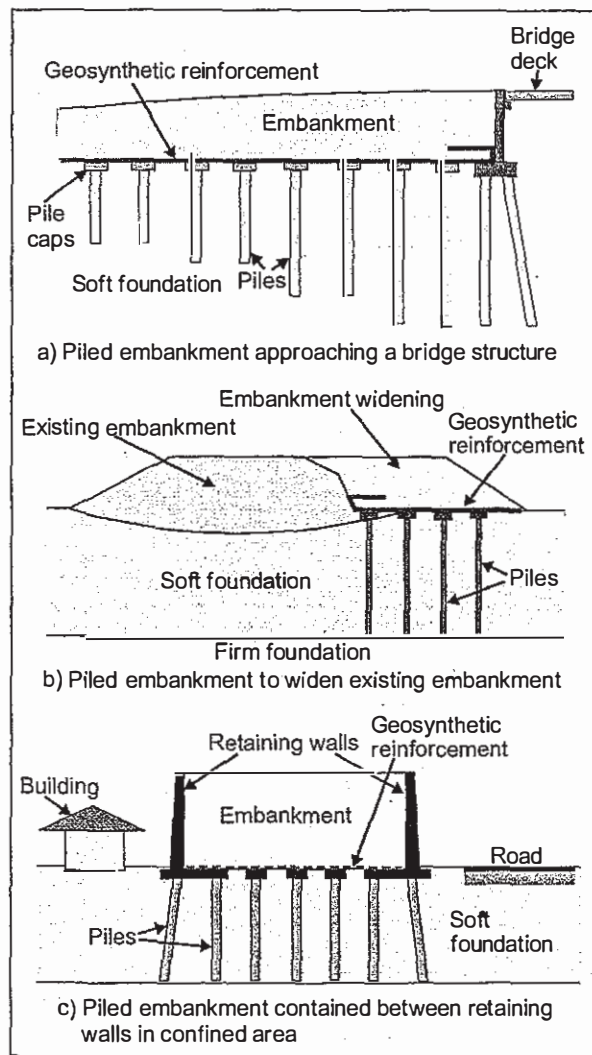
Applications for the use of geosynthetic reinforced piled embankments.
